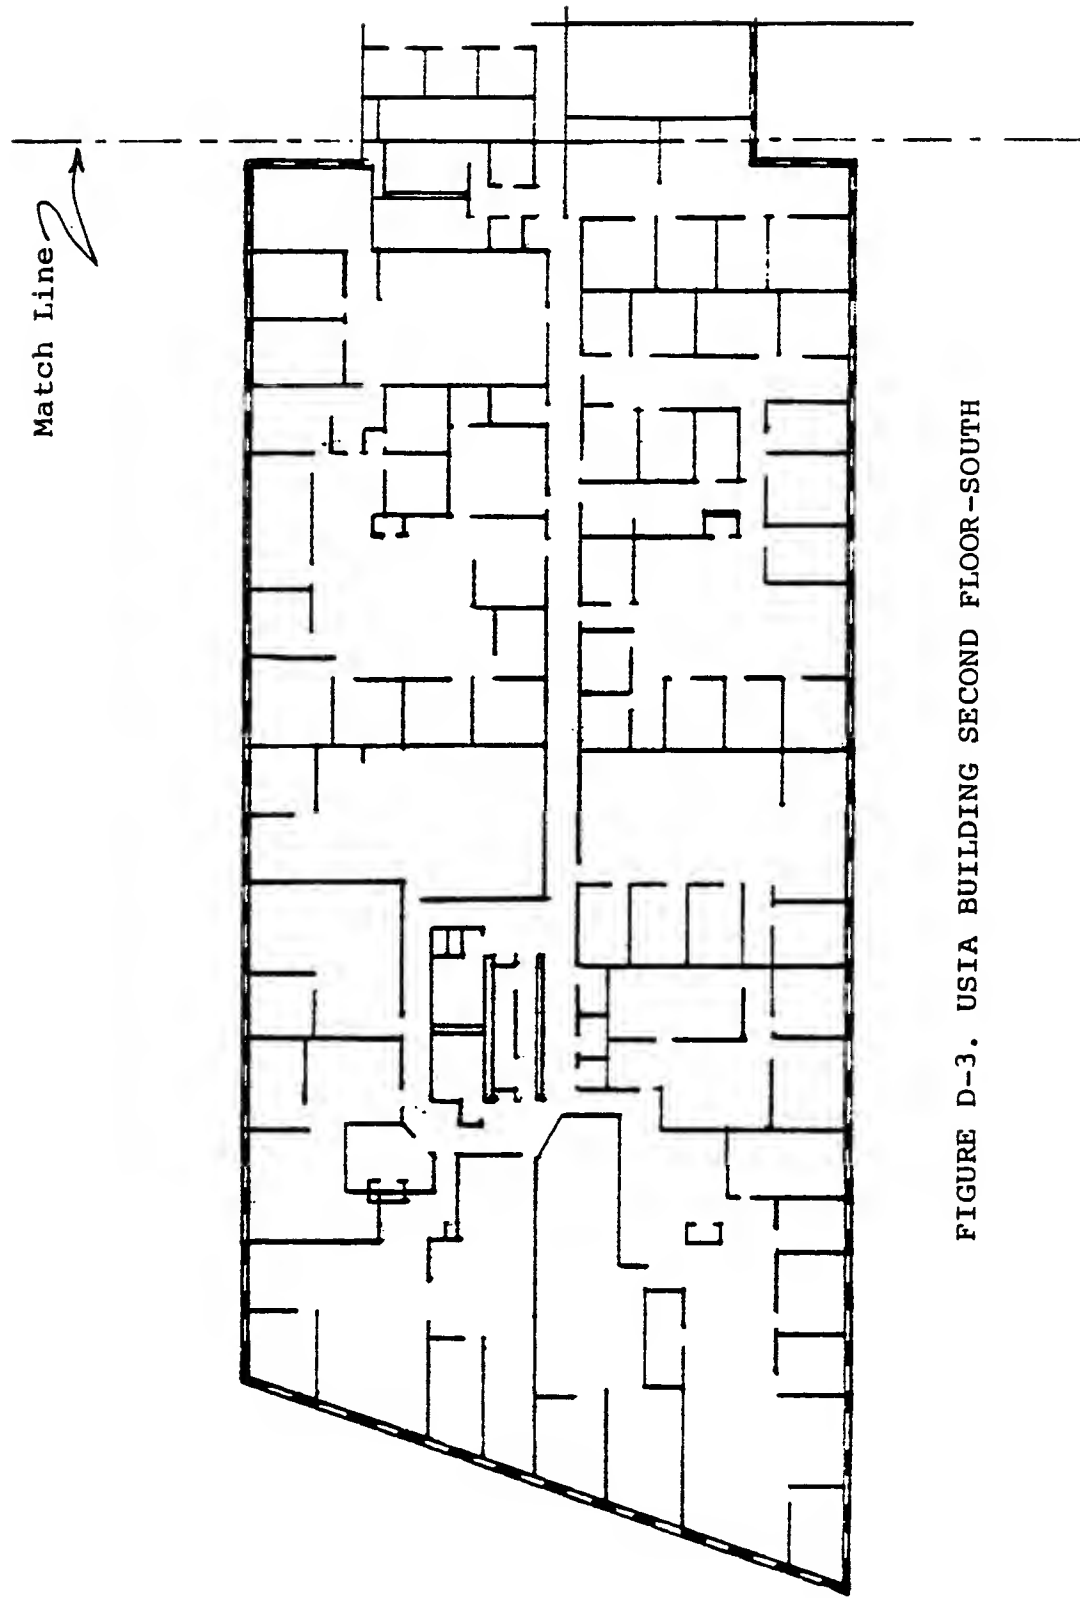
USIA BUILDING SECOND FLOOR-SOUTH
